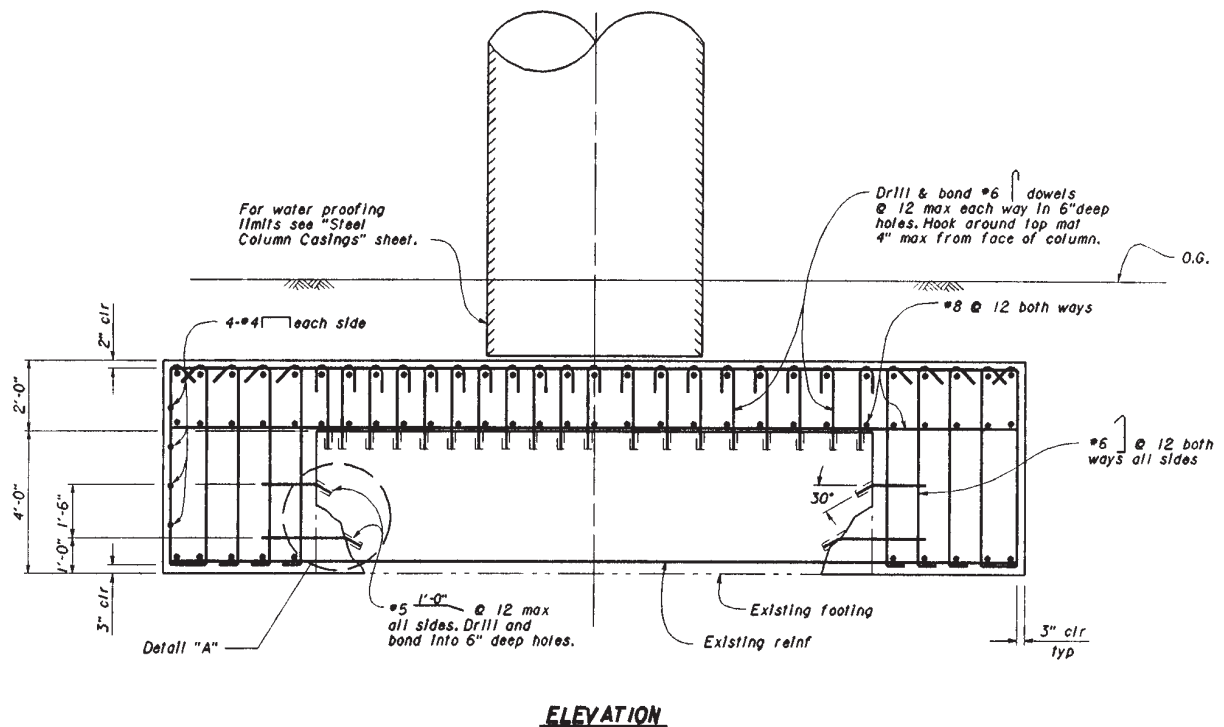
Footing Retrofit (increase footing size and add top mat of rebar)
